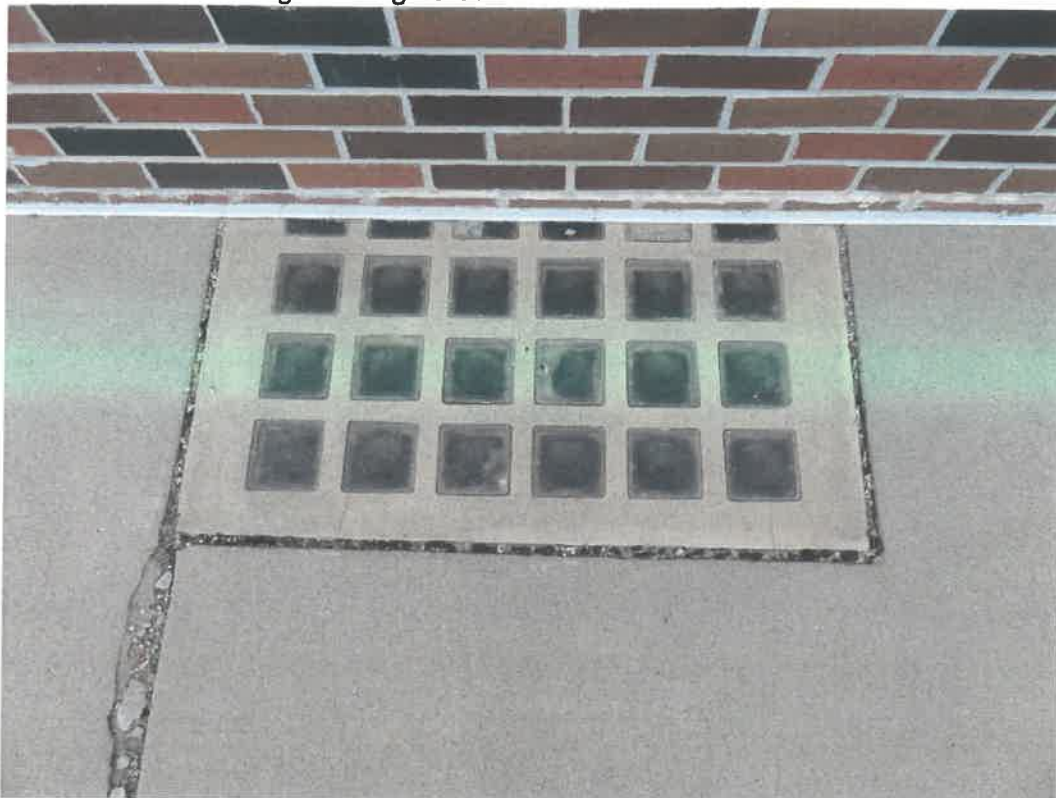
Building No. 22 – Hopkins Block (340 Broadway St)
